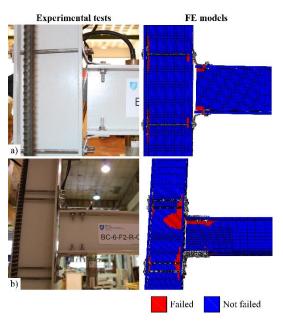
Damage on a beam-to-column connection double-lap specimens.
